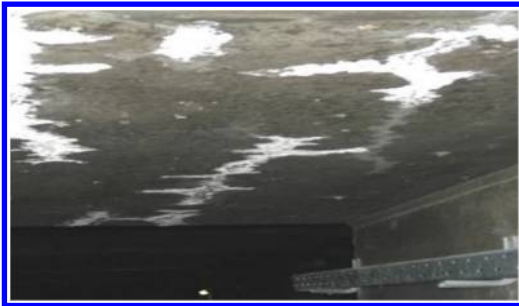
Hairline cracks at the soffit of the top boxbeam slab.
